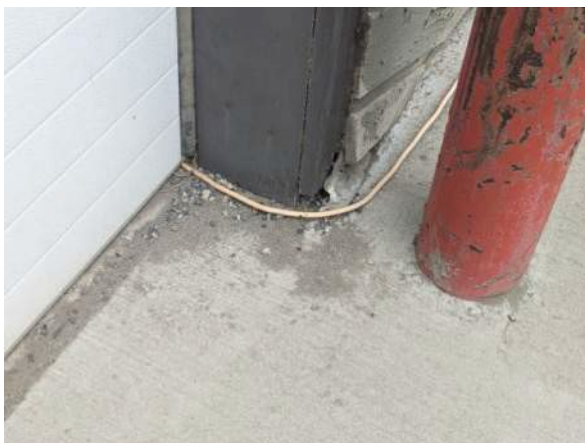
Gaps on South elevation of Maintenance building greater than $\frac{1}{4}$ inch
